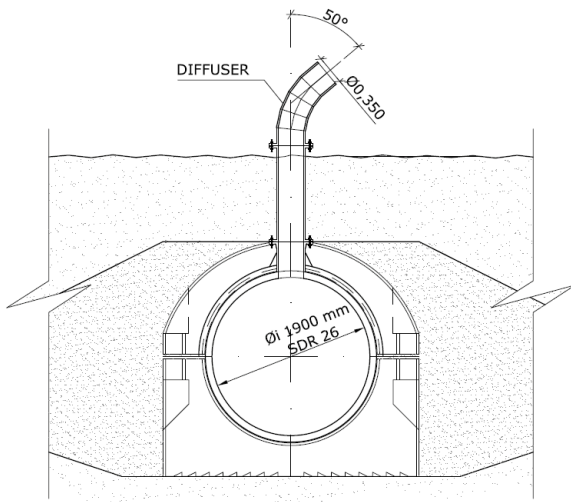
Al Ghubrah desalination plant diffuser section and launching of the pipes.
